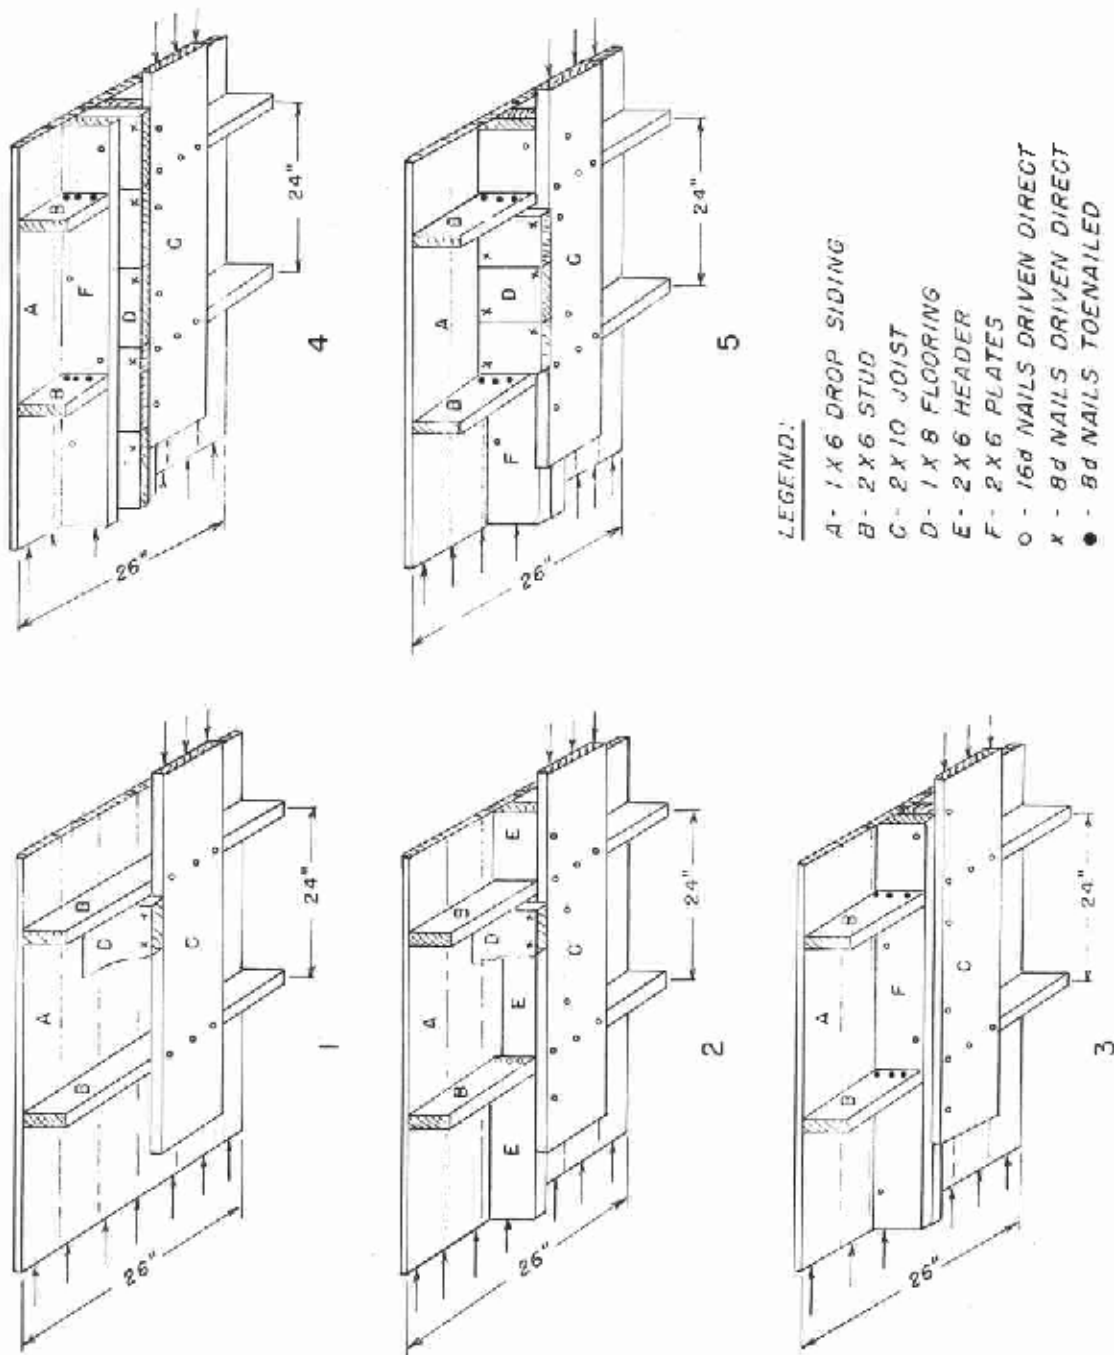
Details of five construction methods used to determine the strength and rigidity of various connections between the barn end wall and the haymow floor.
